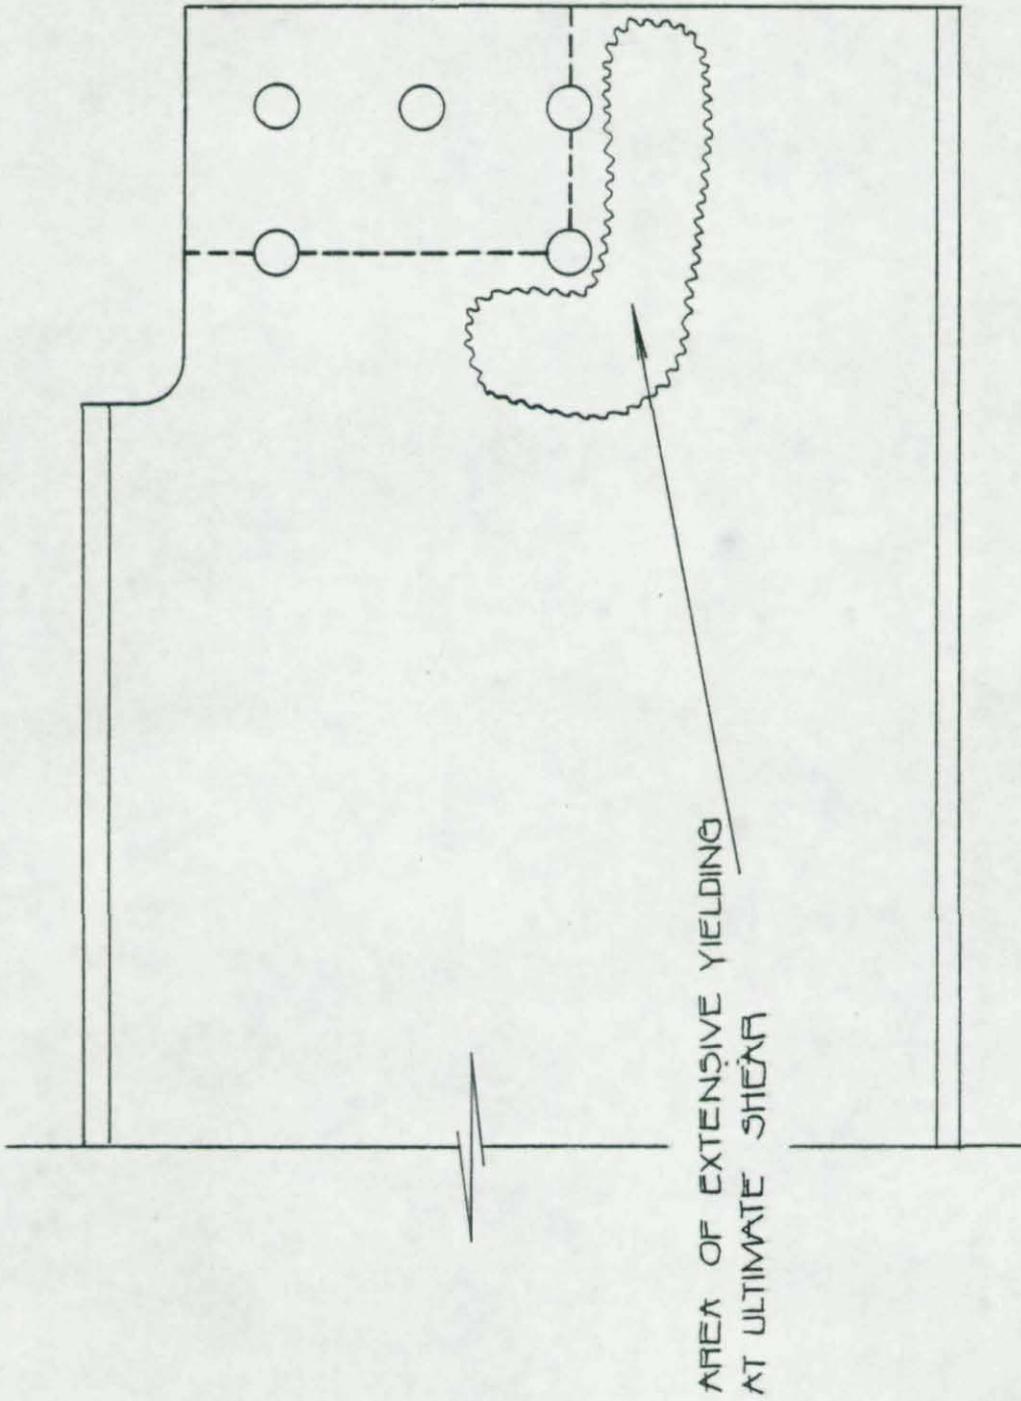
BEAM WITH COPEd TOP FLANGE AT CONNECTION
